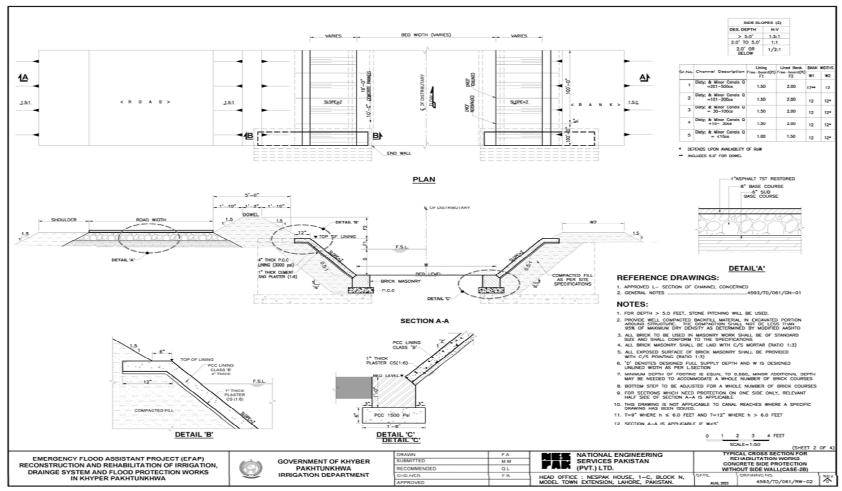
Typical Cross section for Rehabilitation work concrete side protection
